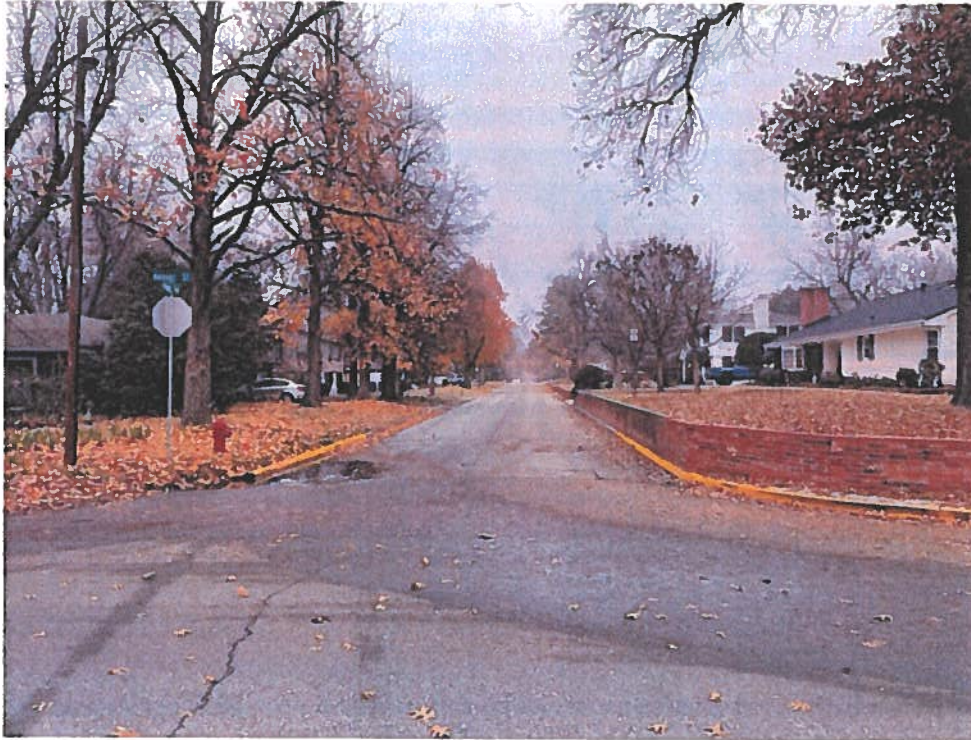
Standing on Hoover Street and looking Southeast along Hoover Street towards 902 Hoover
